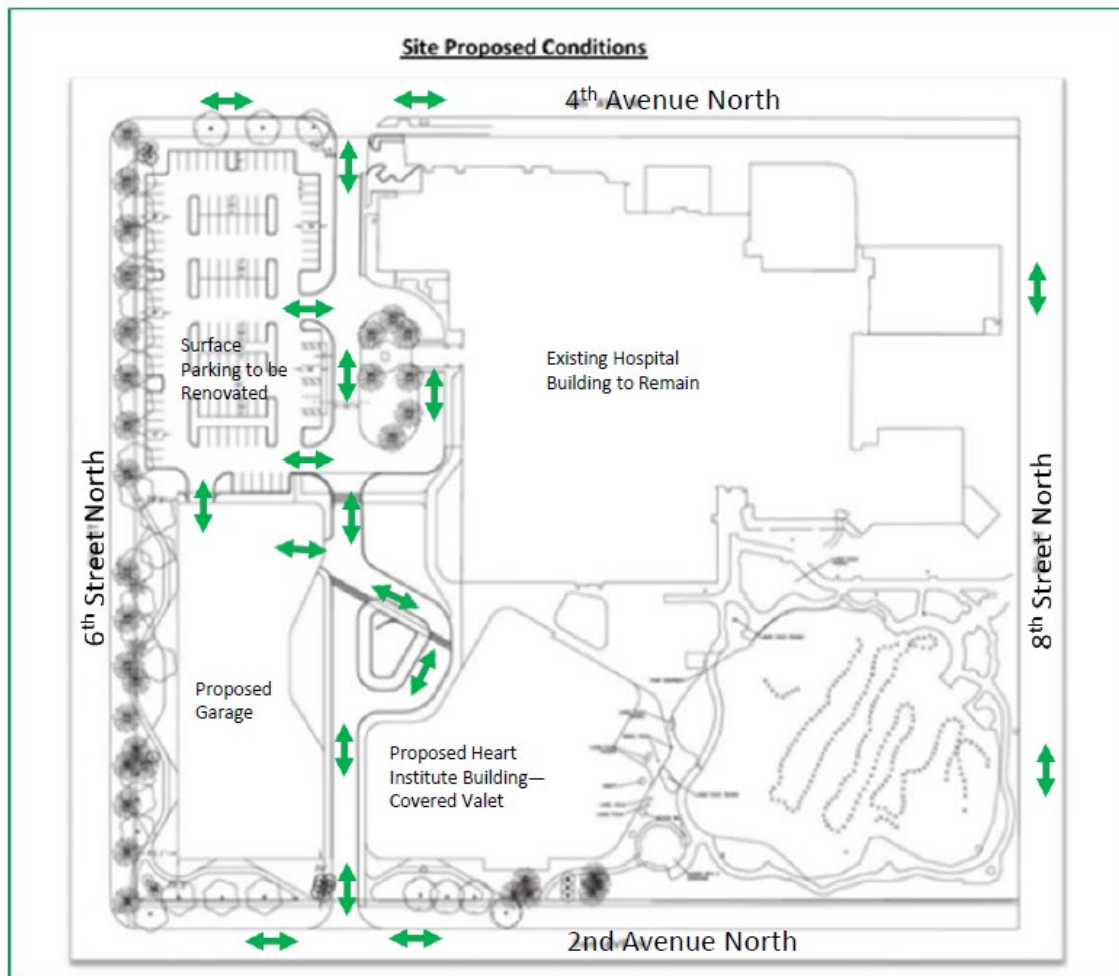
Site Plan of Traffic Flow externally and internally to the site of the proposed garage and proposed Heart Institute Building.
